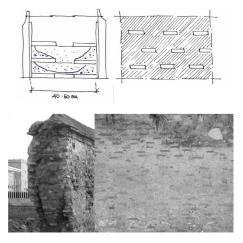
Details of Type 2-wall. Section of the fencing of San Miguel de los Reyes; Elevation Mascarell citywall, Valencia (authors).
